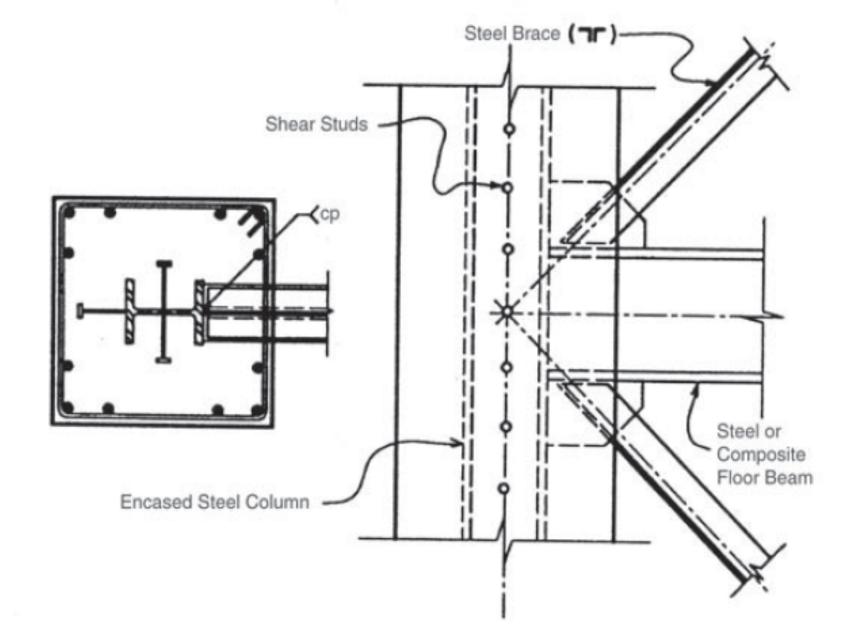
Reinforced concrete (or composite) column-to-steel concentric brace.
